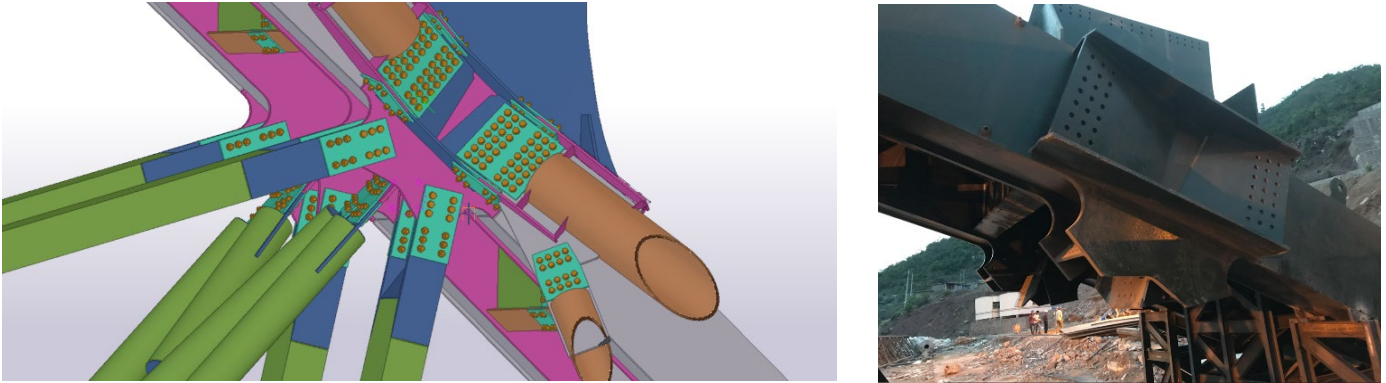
The arch structure in the Tekla model and positioned for pre-assembly on the assembly field
